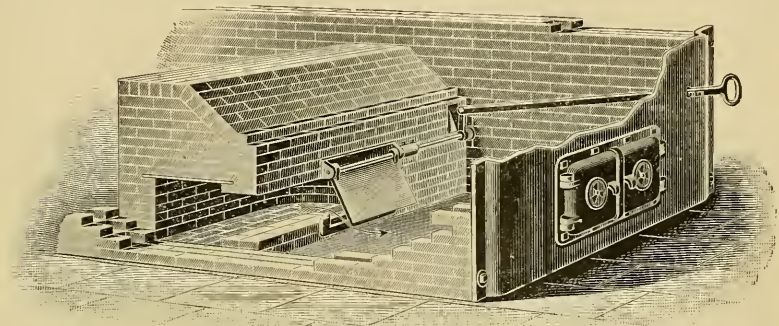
ASHPIT DAMPER IN BRIDGE WALL.
